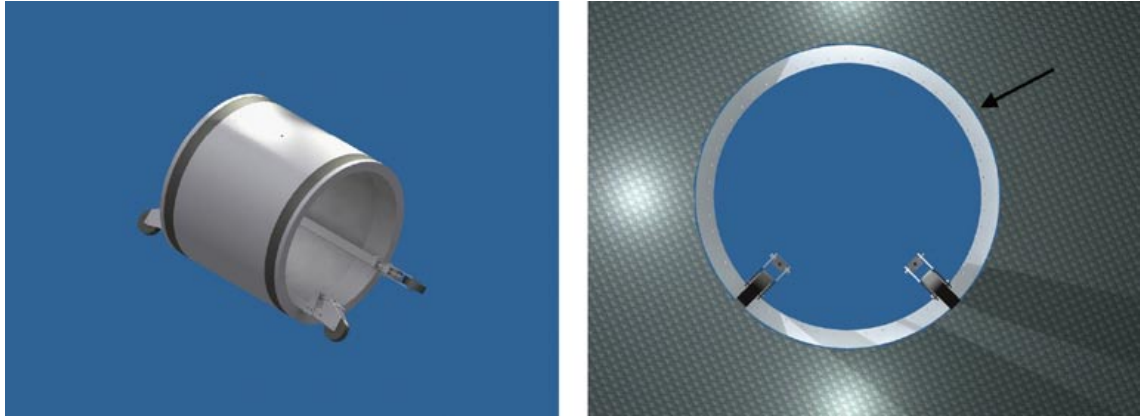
Mega-Packer grouting device, 3D view and cross section perpendicular to the drift. The gap between the rock and Mega-Packer is filled with grout, which is forced into the rock fractures by high pressure.
